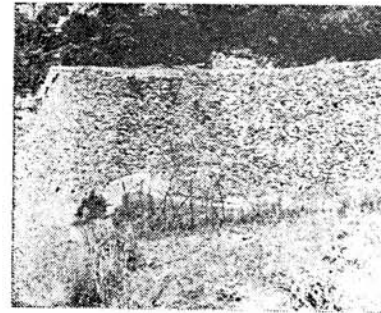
7 m high dry stone masonry retaining wall, with side pedestrian-way of the same masonry
